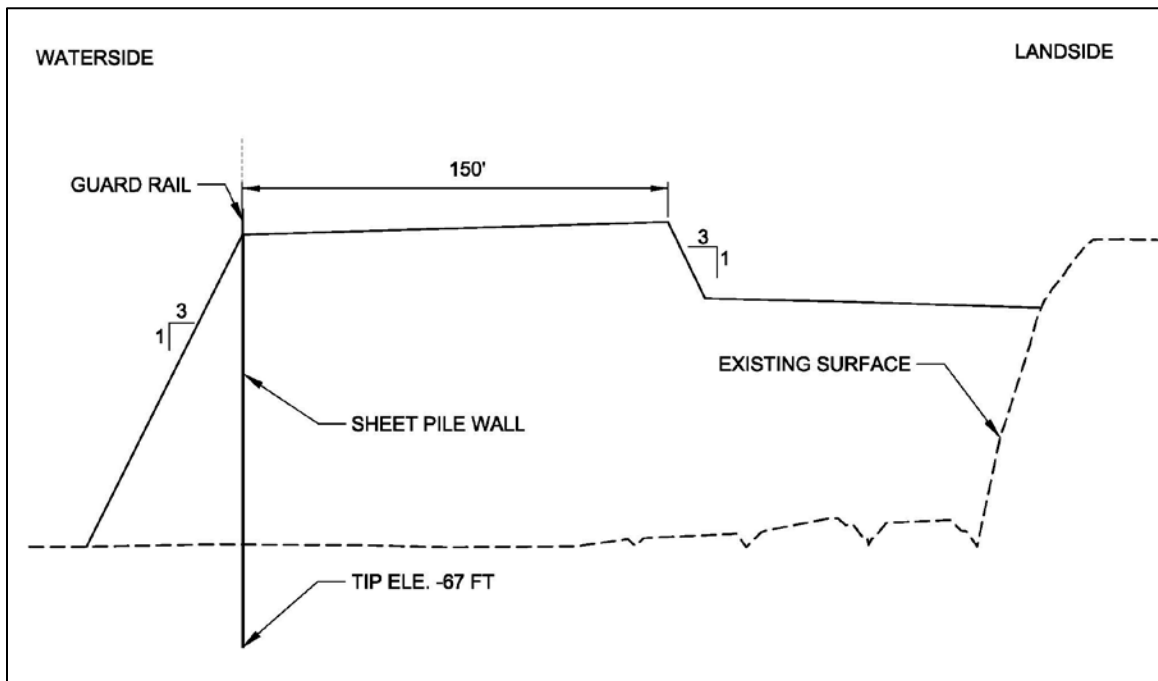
Sheet Pile Wall with Embankment Fill.
